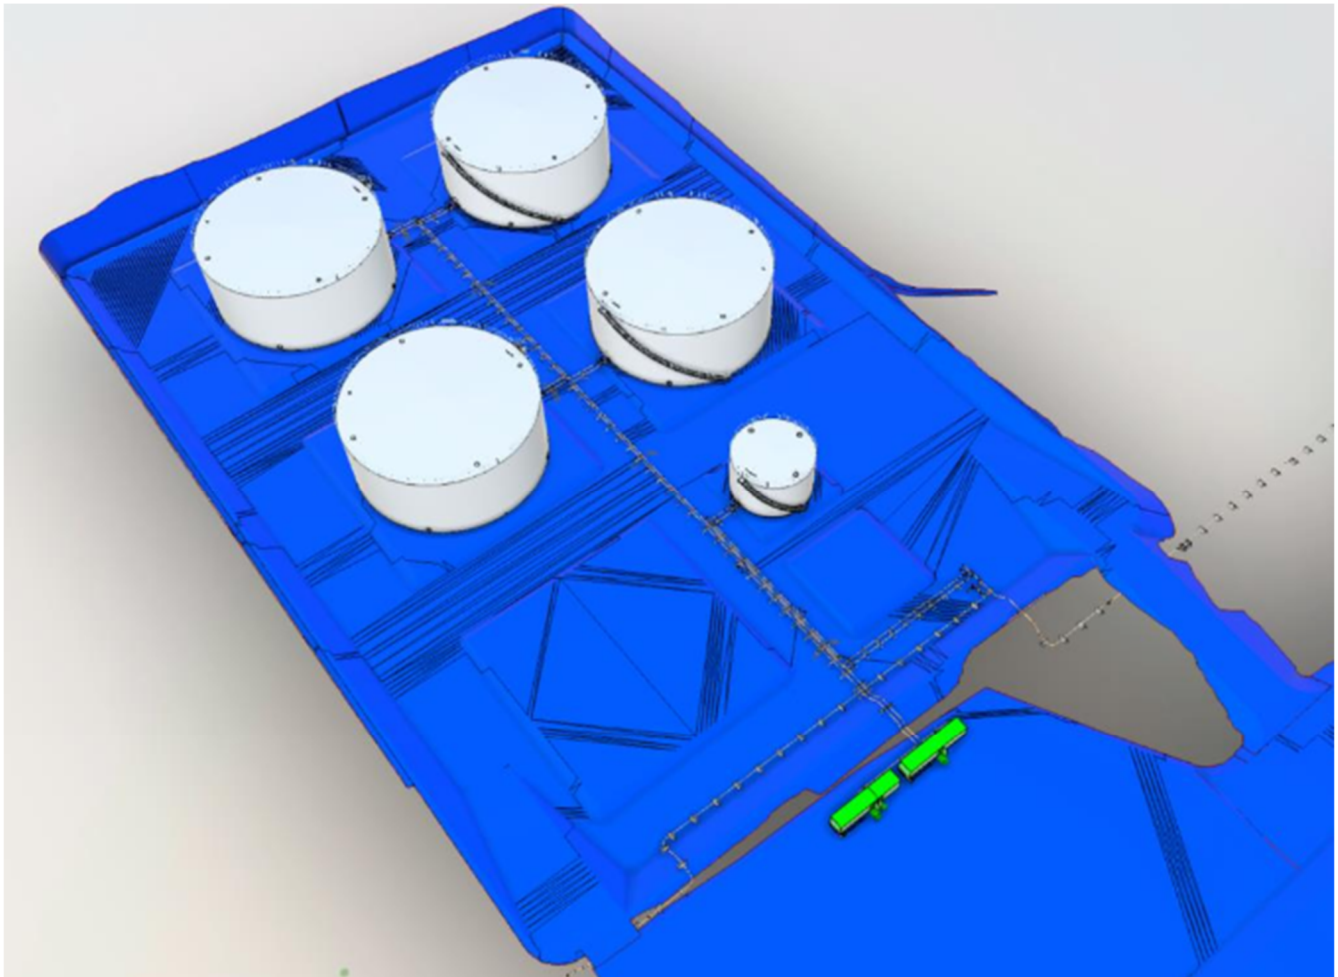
Planned Construction 2028: Piping, Electrical, Pump Station Completed
